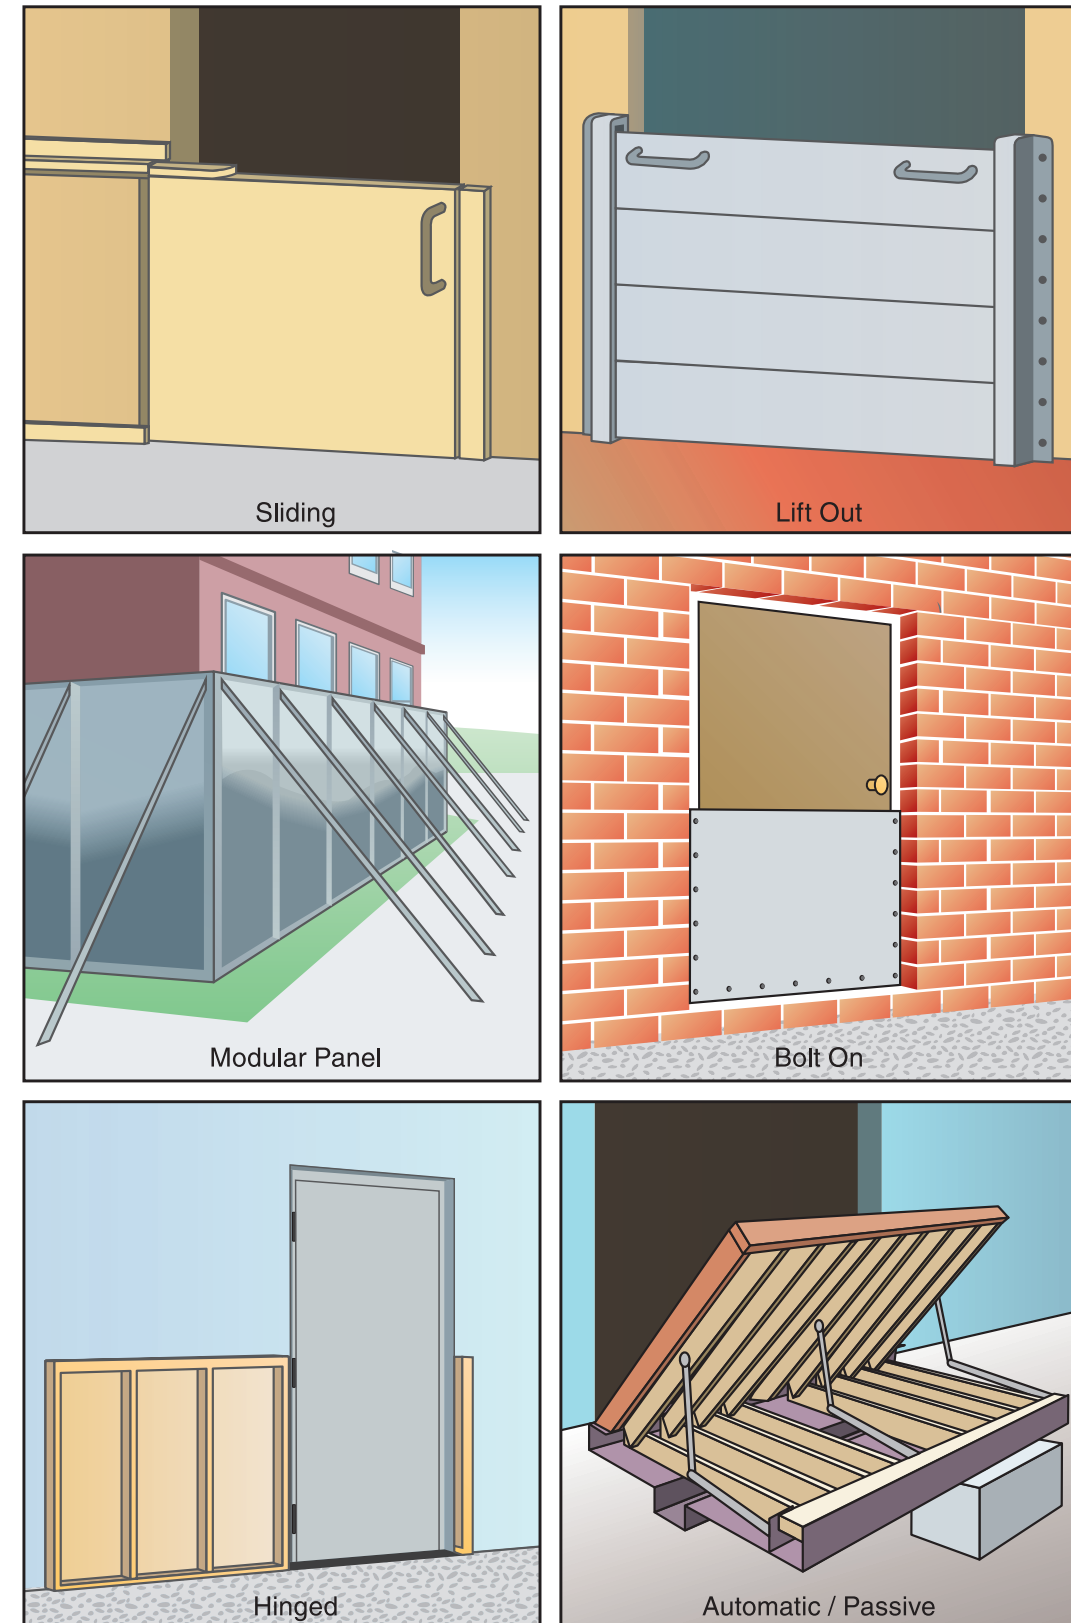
Floodproofing Non-Residential Buildings, FEMA P-936, July 2013.
